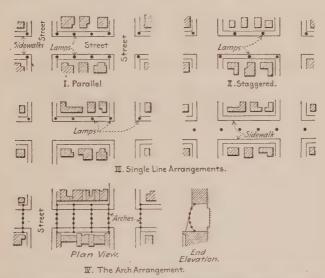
Arrangement employed in locating tungsten series street lighting units.
